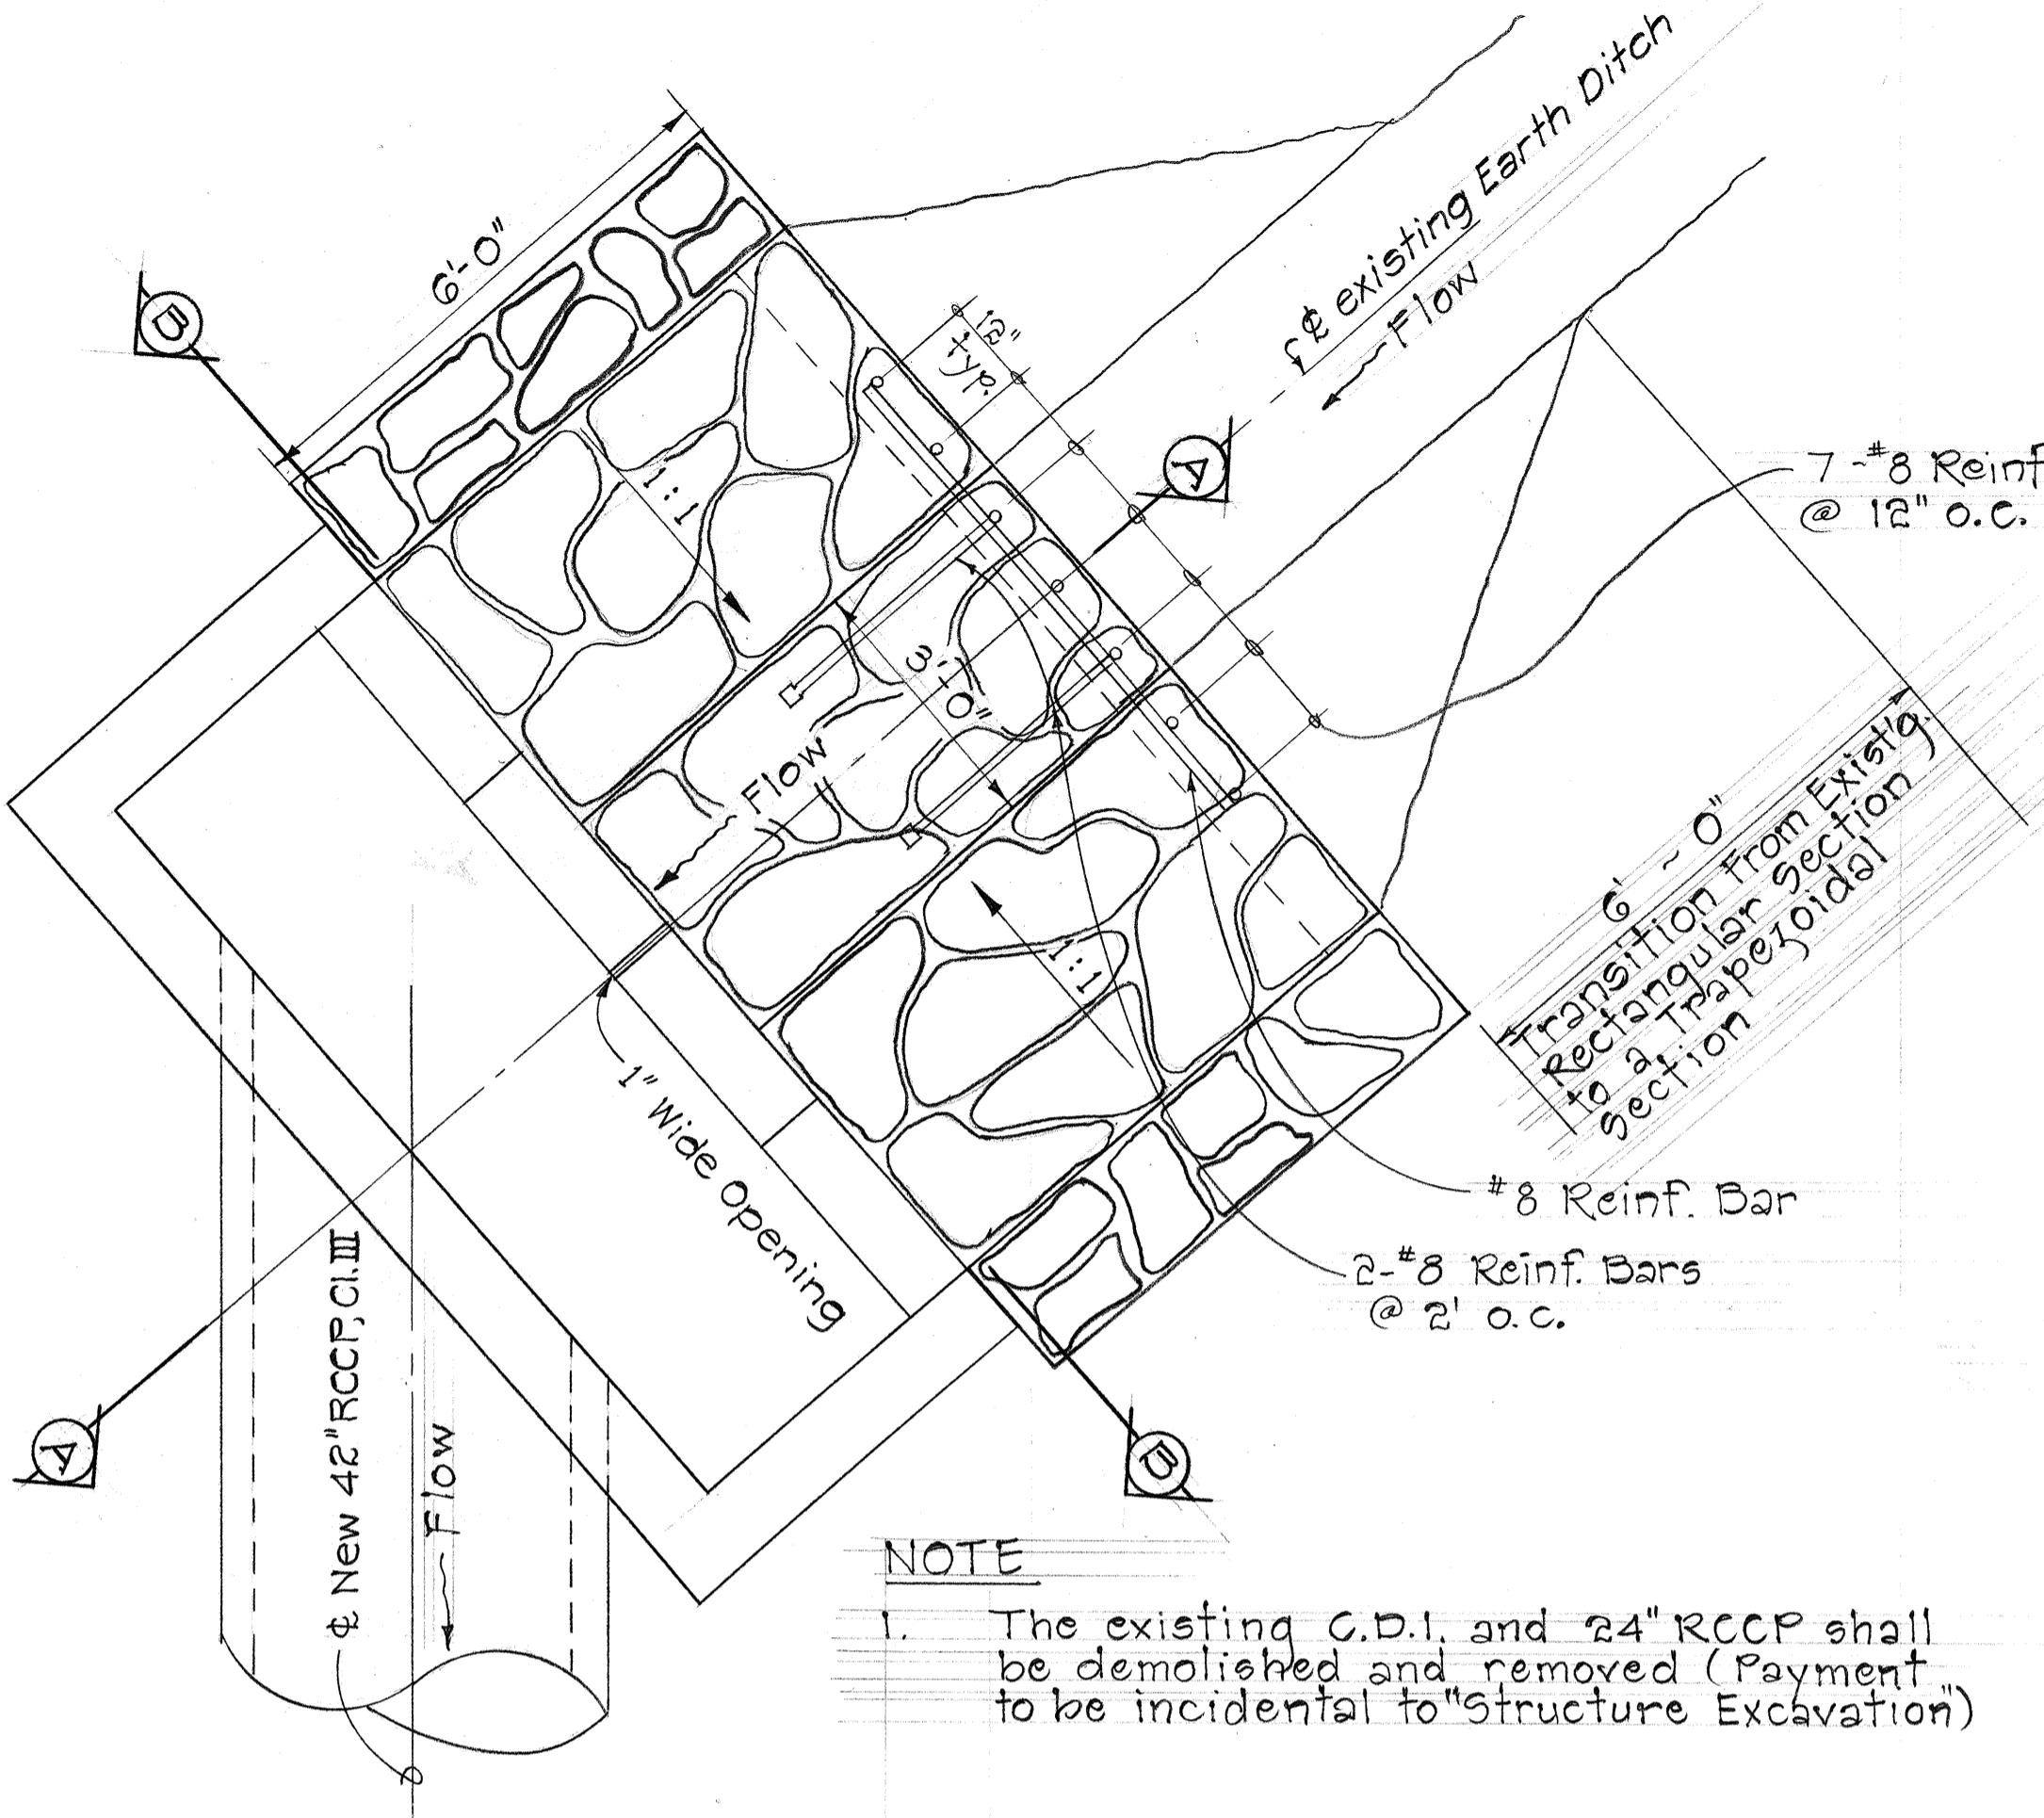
DETAIL OF NEW TYPE "C" S.D.M.H @ STA. 87+84
